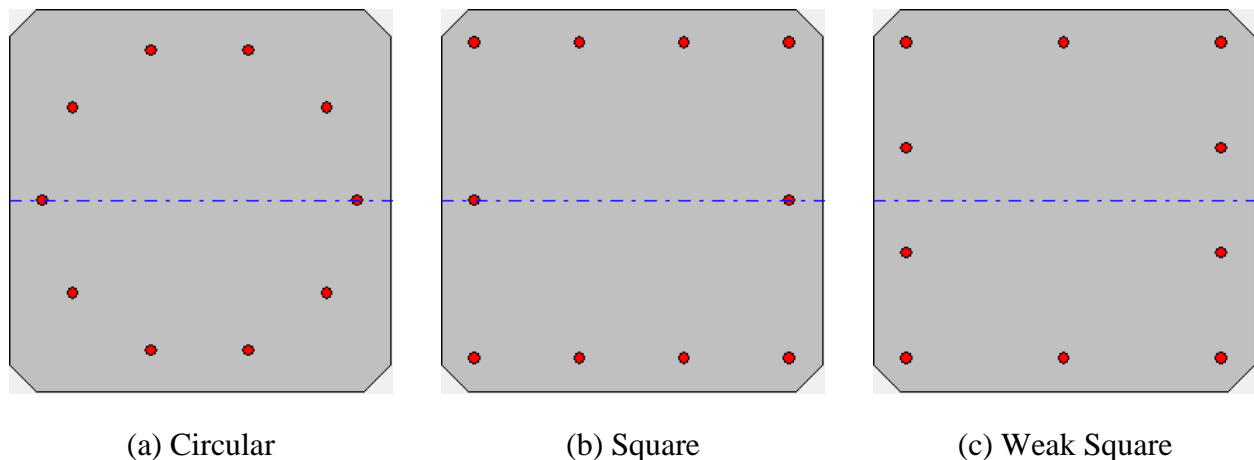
Automatic Prestressing Arrangements for Square Prestressed Piles
